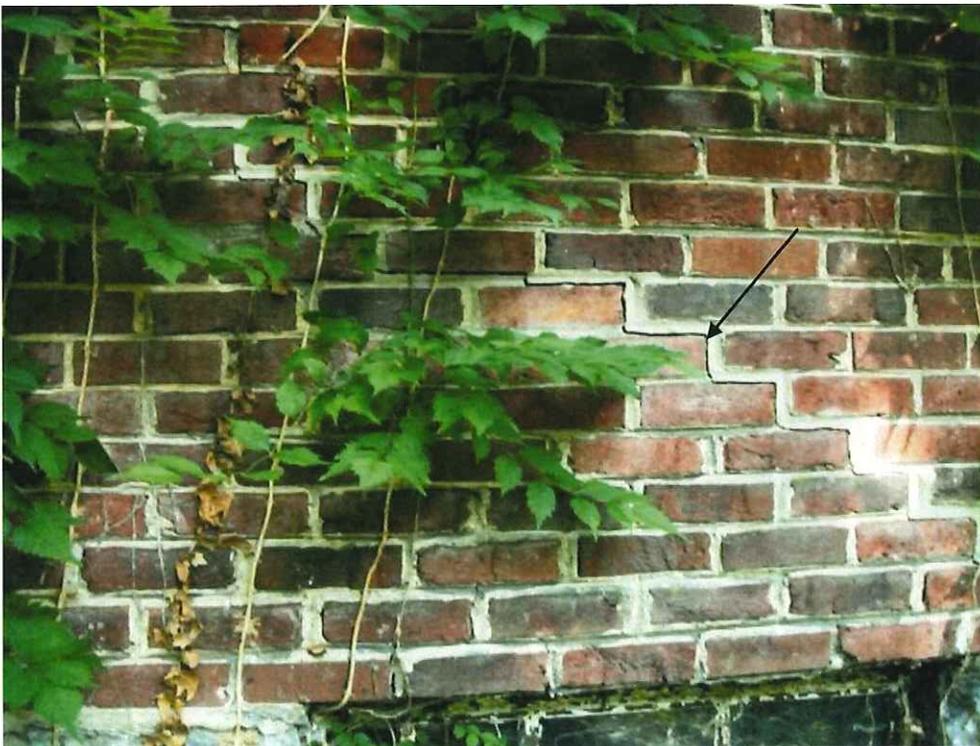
Bowing and cracking of the brick veneer on the right side of the residence.
